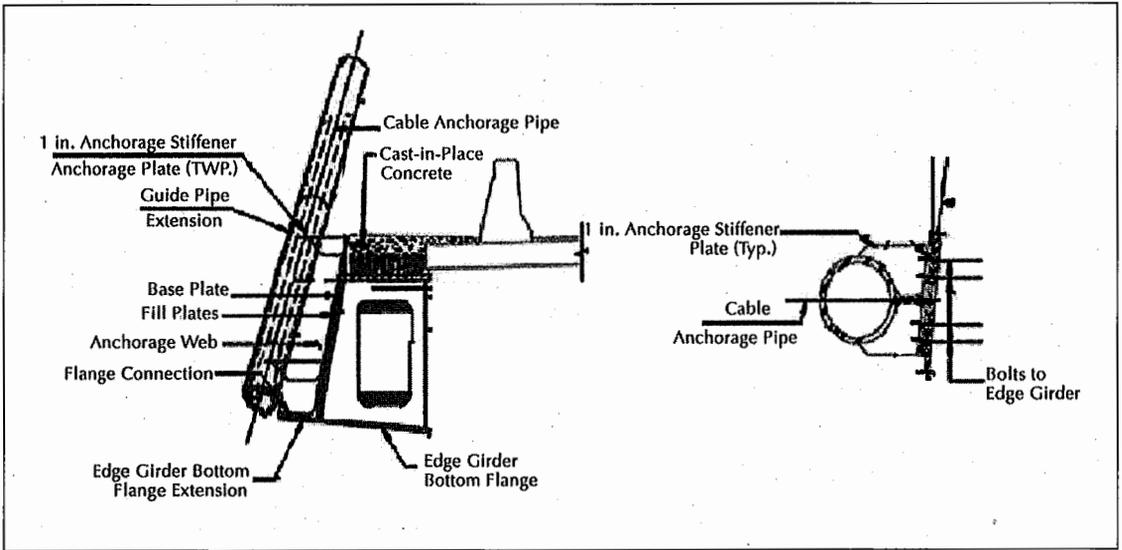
Stay cable pipe anchoring to the steel edge box girder.
